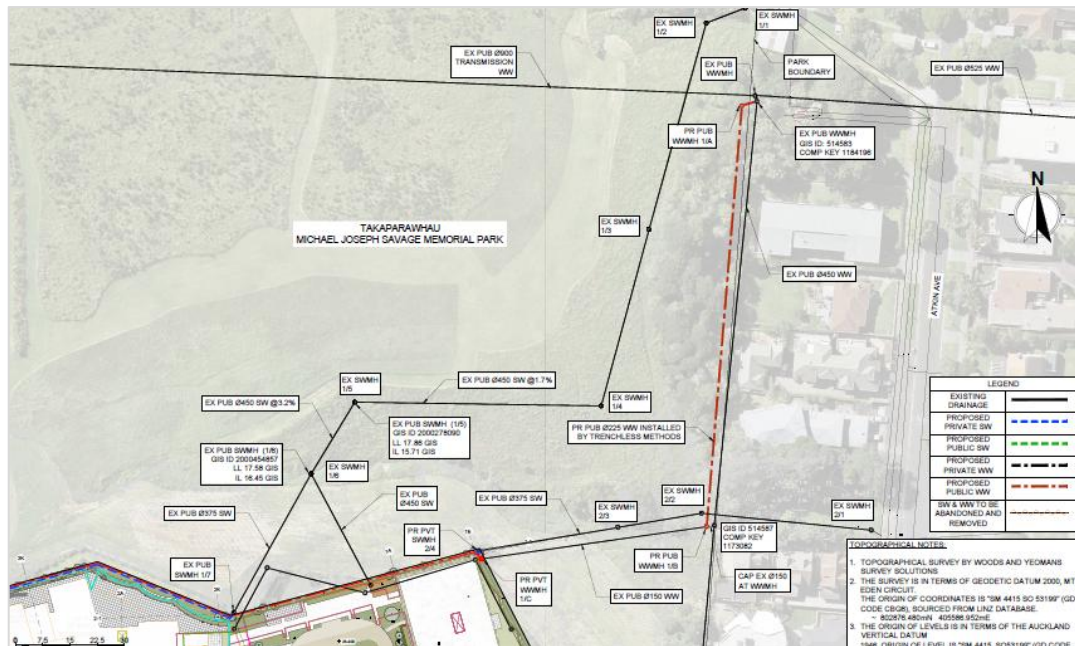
Proposed stormwater drainage layout (Source: Drawing RC-933).
